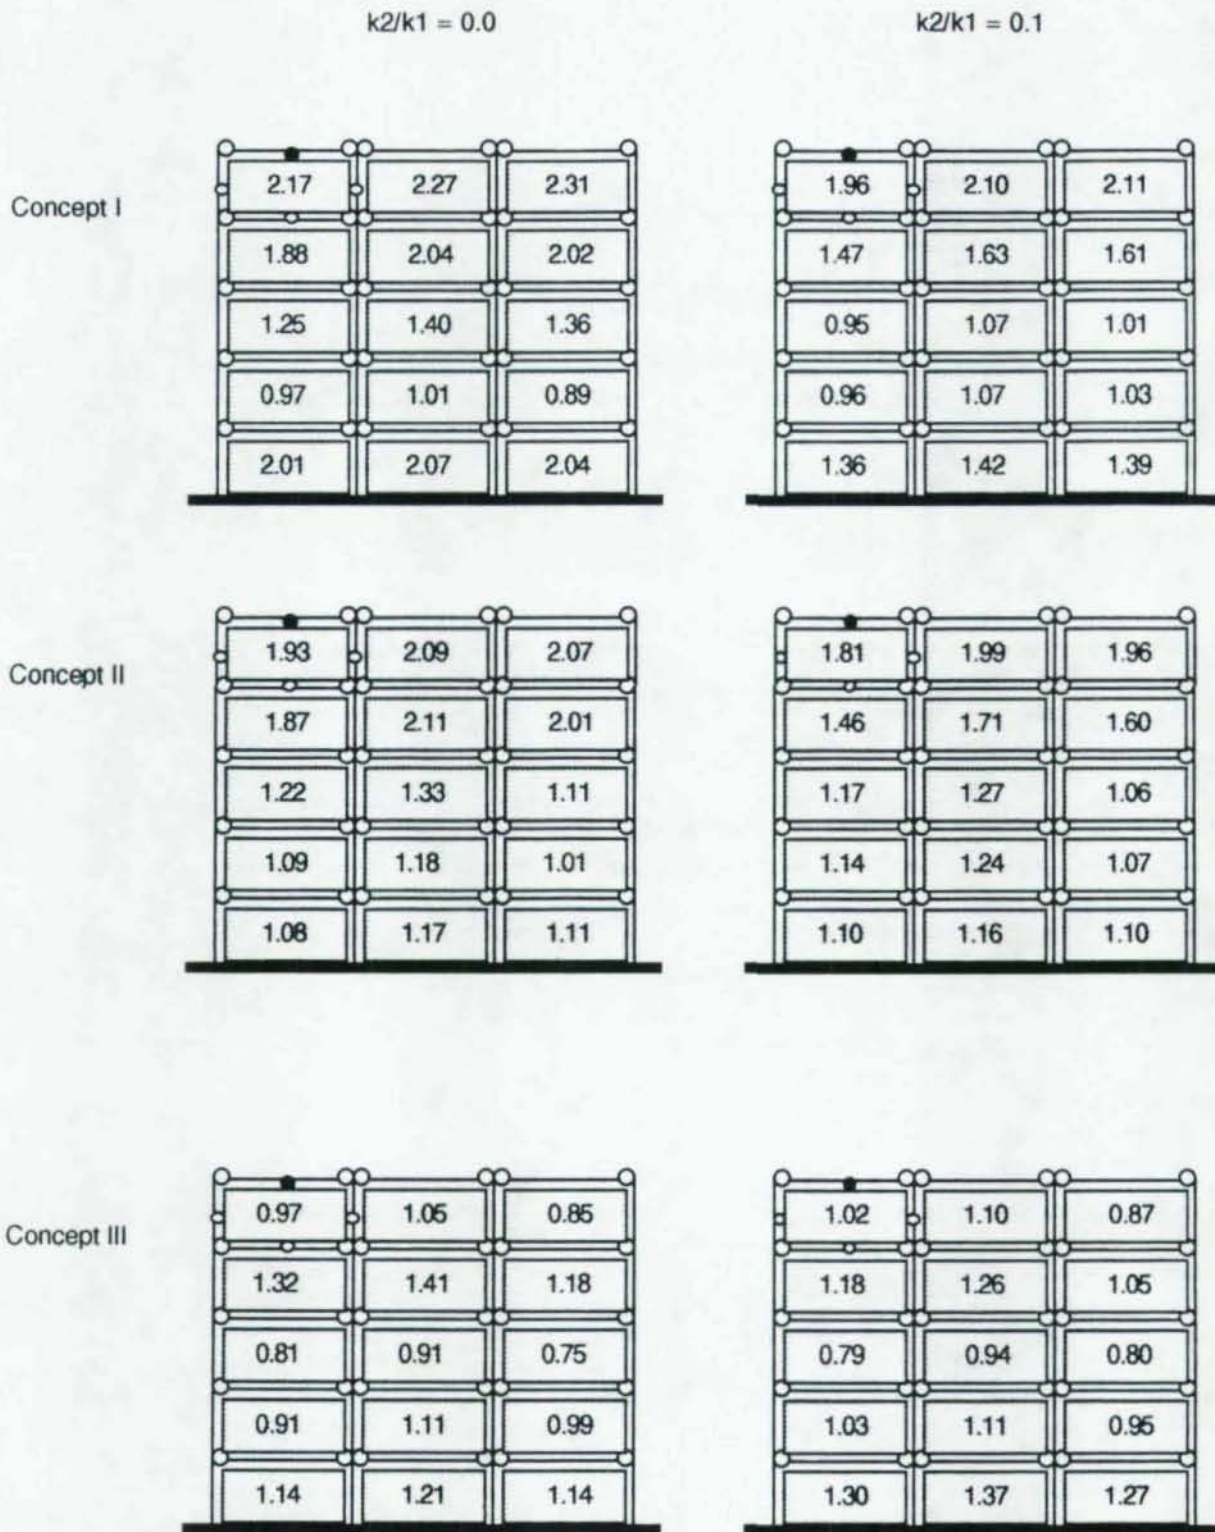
Clad Frame C: Envelopes of Deformations (in.) of Top Panel Connections
